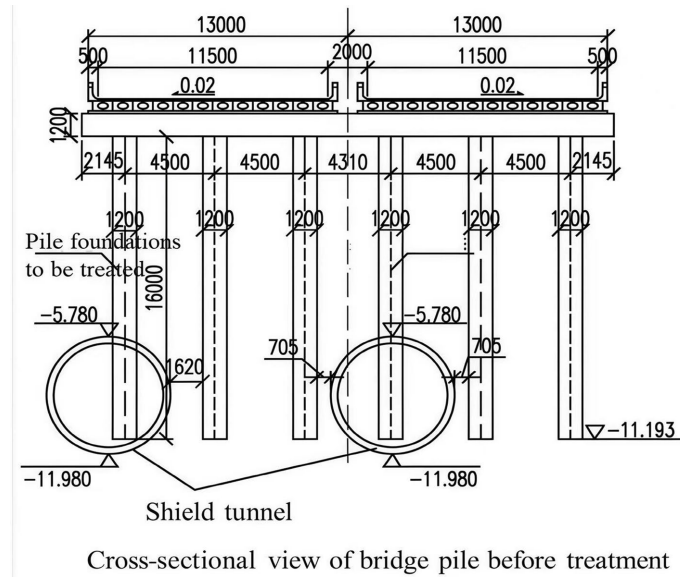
Profile of the shield tunnel relative to Dongwang Bridge.
